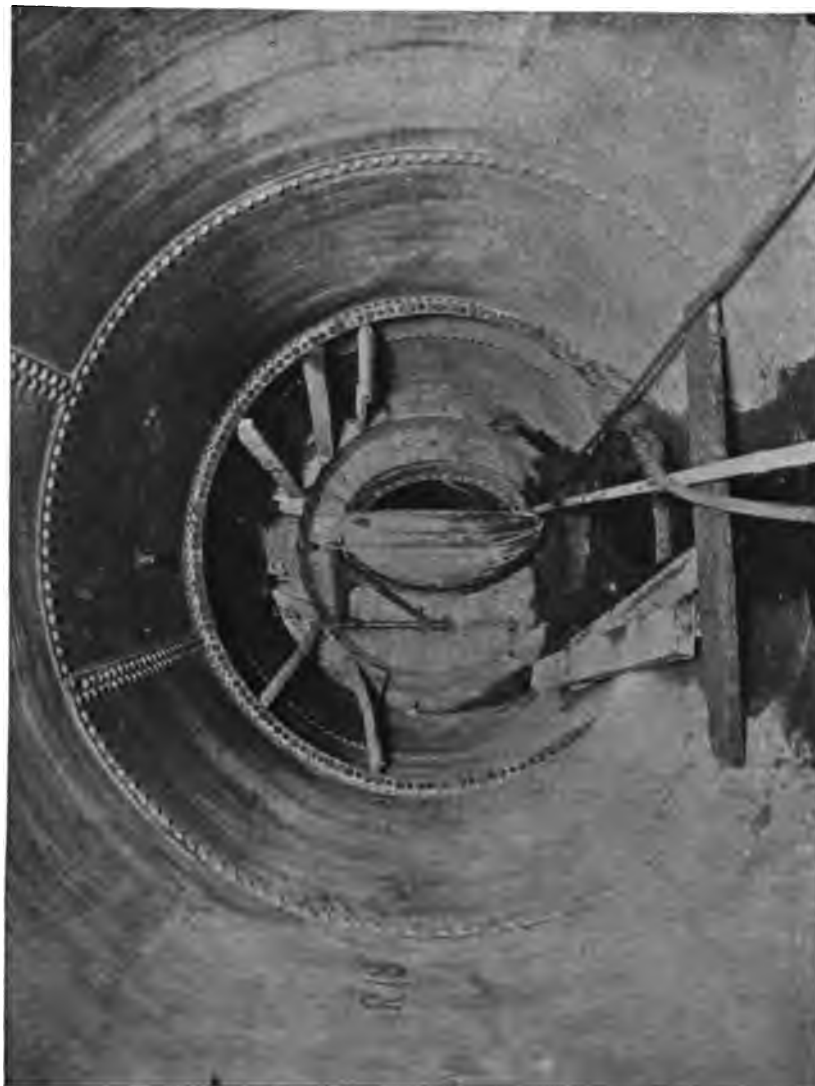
Rondout Siphon.—Steel Interlining in Drift at Foot of Drainage Shaft. Bronze access door closing drift and tunnel.
